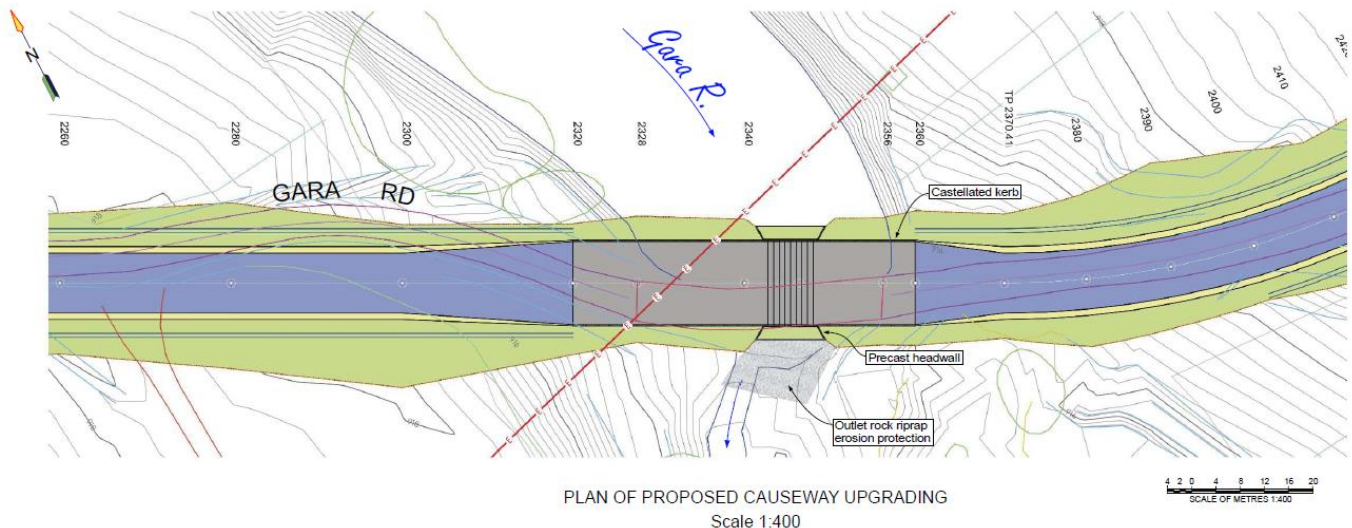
Aerial plan view of proposed Gara Road causeway upgrade
